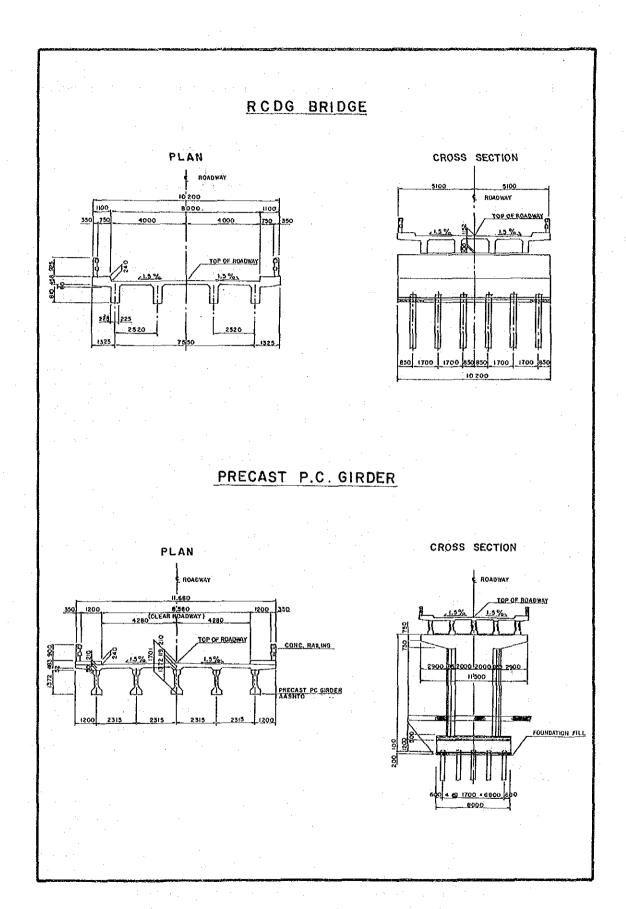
TYPICAL BRIDGE SECTION
